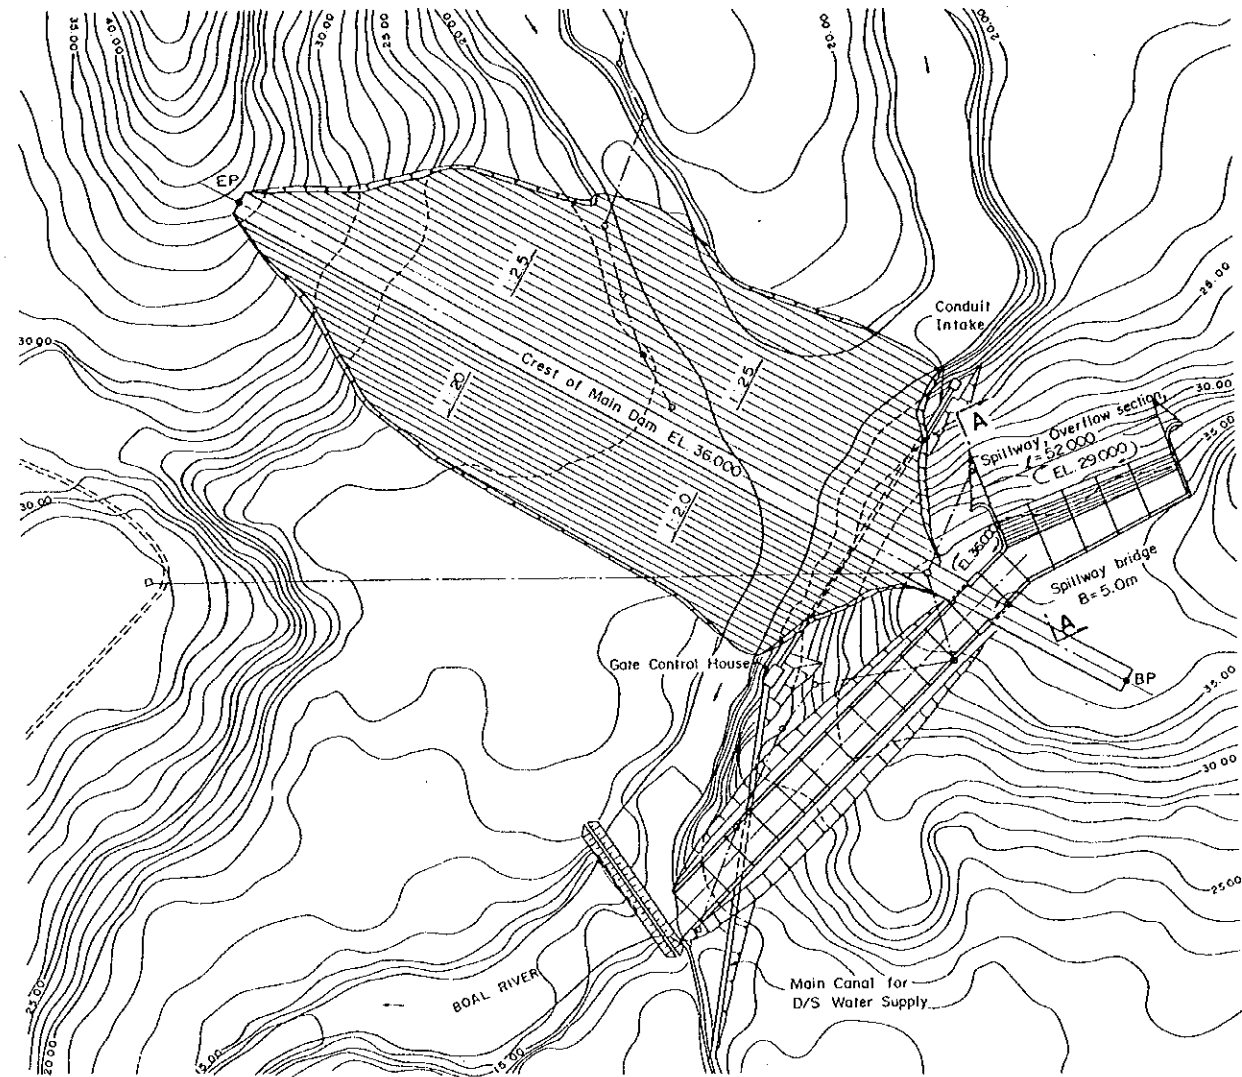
General Plan of Tiu Tui Embung (1/2)
